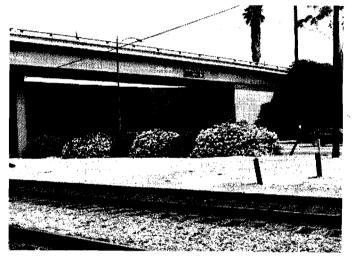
Landscaped area of R.O.W. at Ventura Freeway
